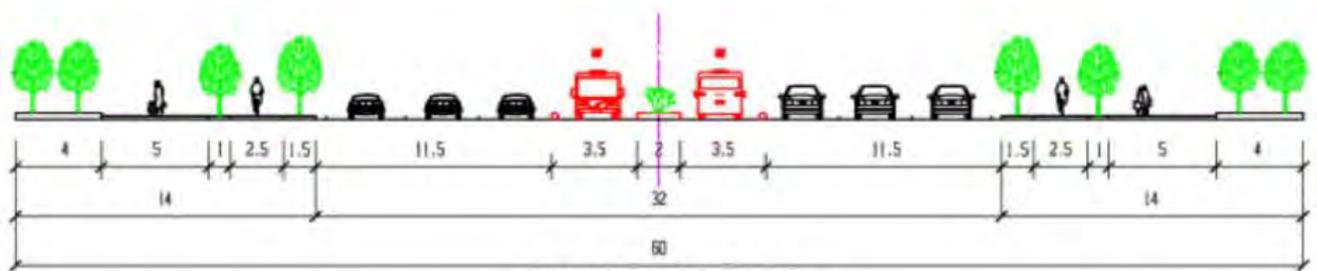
Section showing road spacing for Guangzhou's BRT network. Between station intervals. Notice single lanes available for BRT. Units are metric (www.gzbrt.org).
